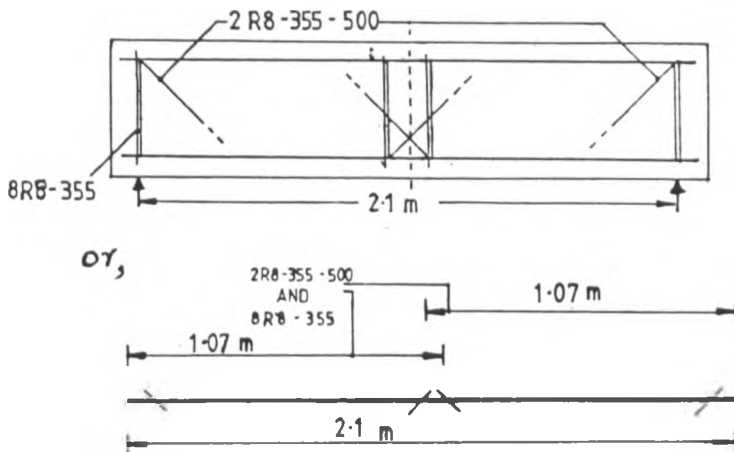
DETAILS OF TRANSVERSE STEEL
